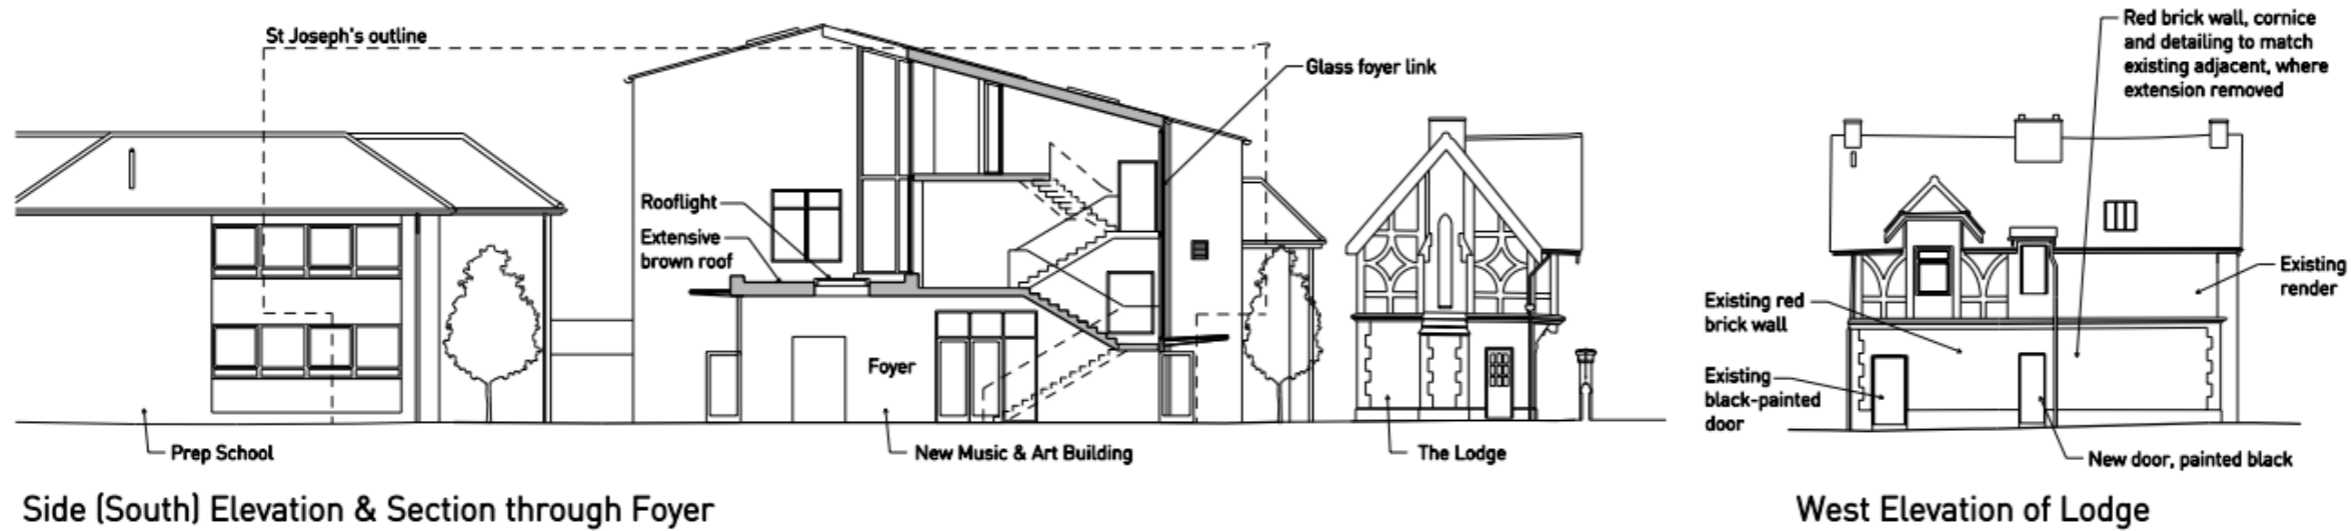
Refused Scheme showing Section EE and West Elevation of Lodge (Source: Tim Ronalds Architects)
